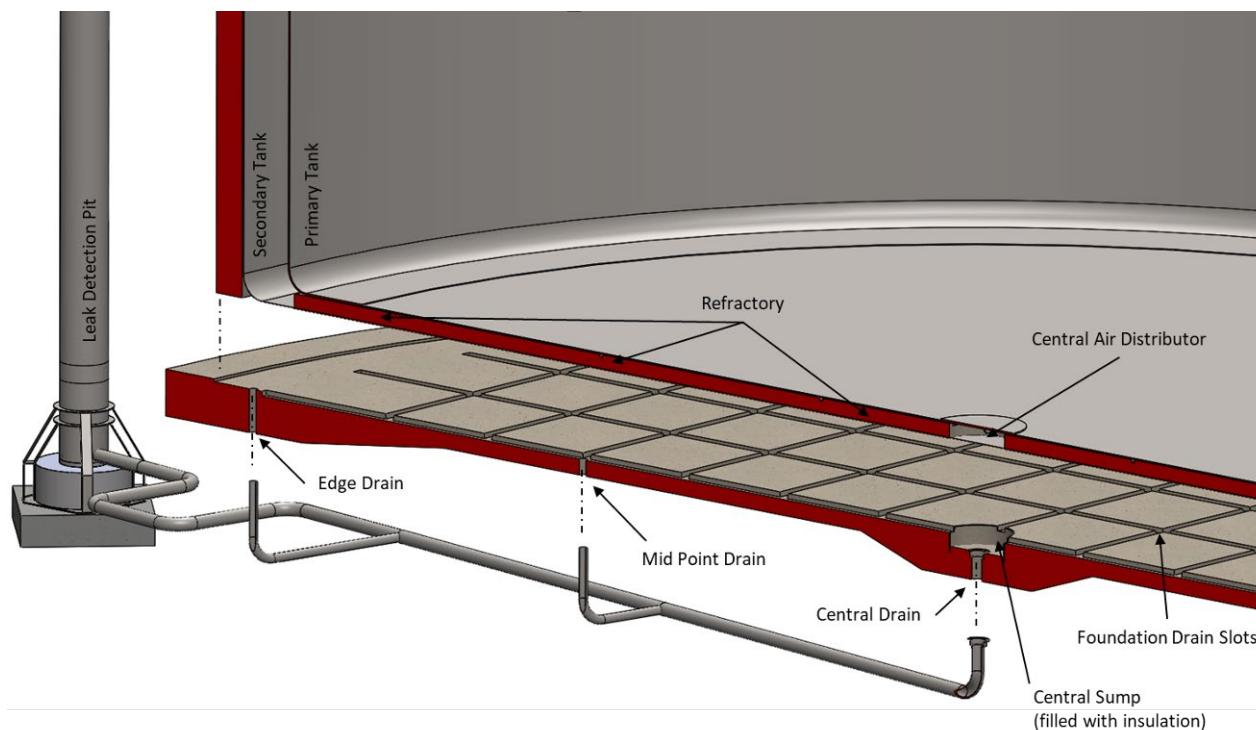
Schematic of a double shell tank depicting primary and secondary tank shells, concrete foundation, and drain slots.
